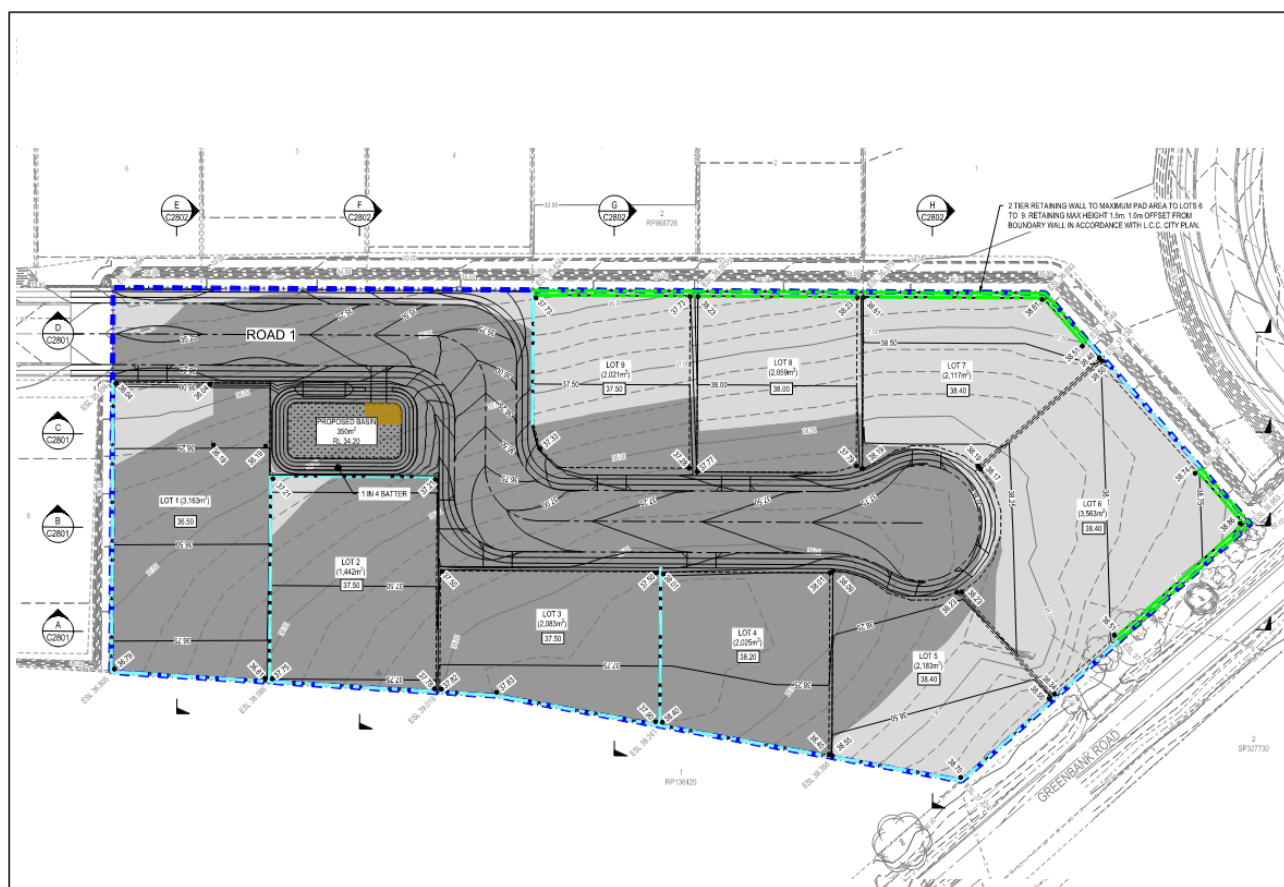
Concept Layout Plan (Burchills, 2026)
